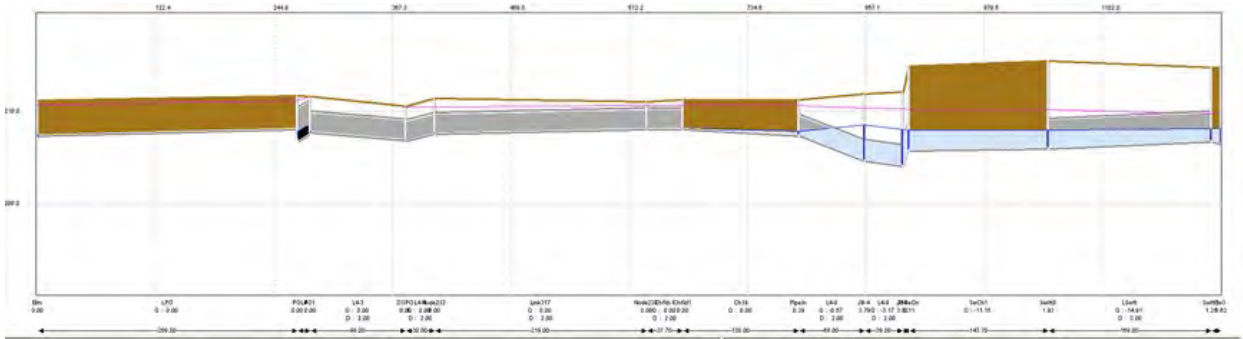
Existing System from Post Office Ditch Fourth St Ditch Outlet
